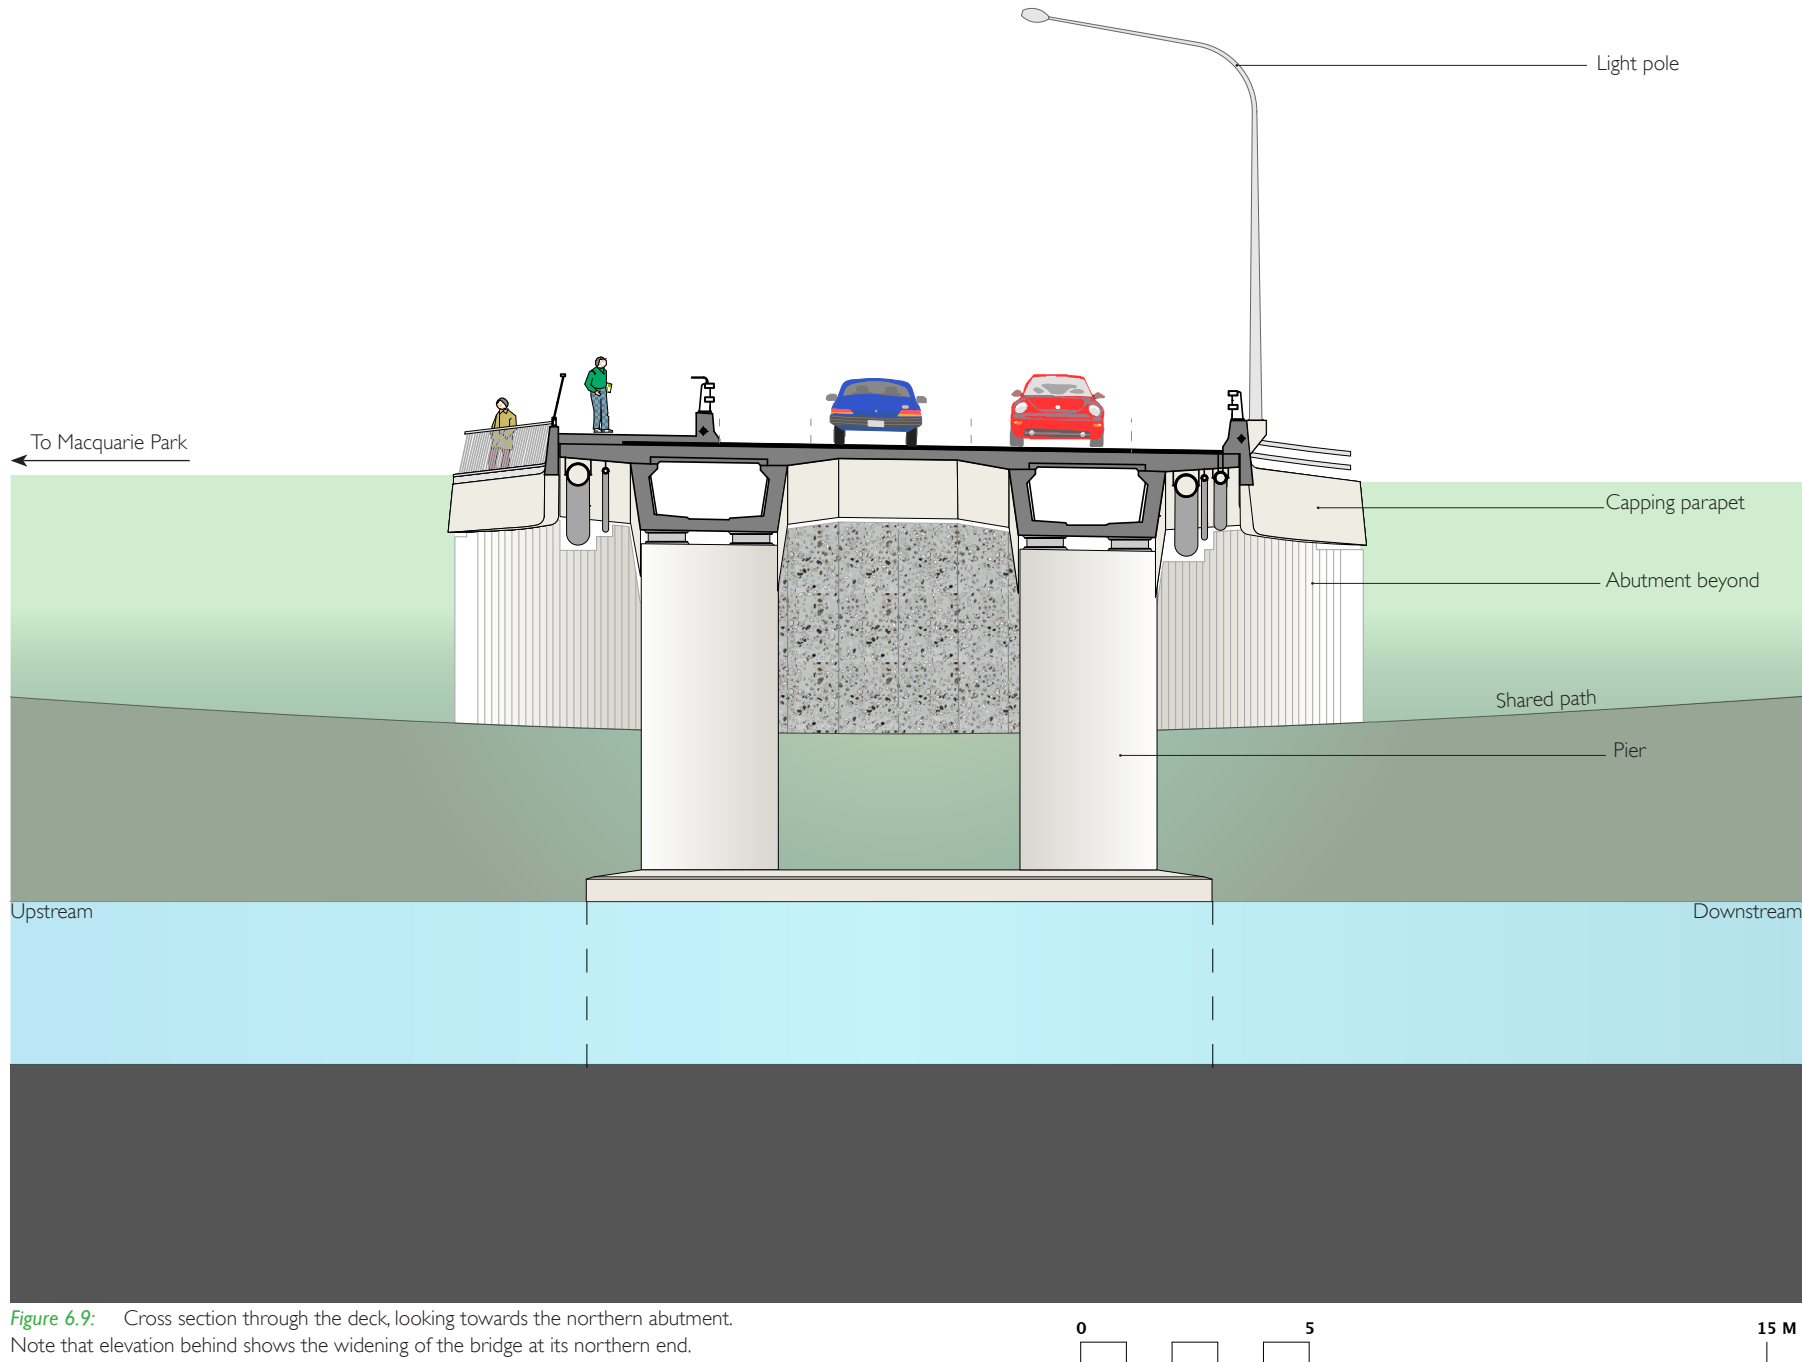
Cross section through the deck, looking towards the northern abutment. Note that elevation behind shows the widening of the bridge at its northern end.
